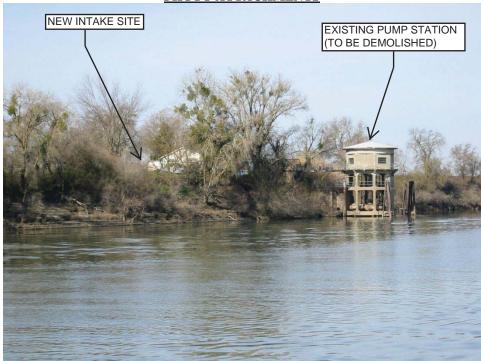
EXISTING RD2035 PUMP STATION (TO BE DEMOLISHED) AND NEW INTAKE SITE. LOOKING WEST.
